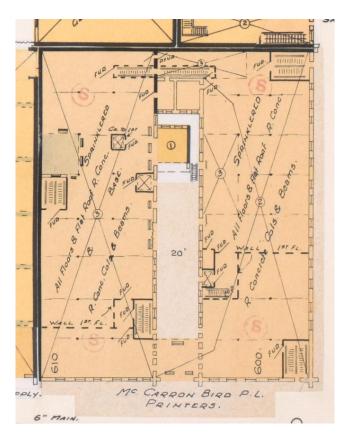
Section of a Mahlstedt plan, amended post-1962, showing the subject building. (Source: Mahlstedt Map section 2, no 1a, 1962)
